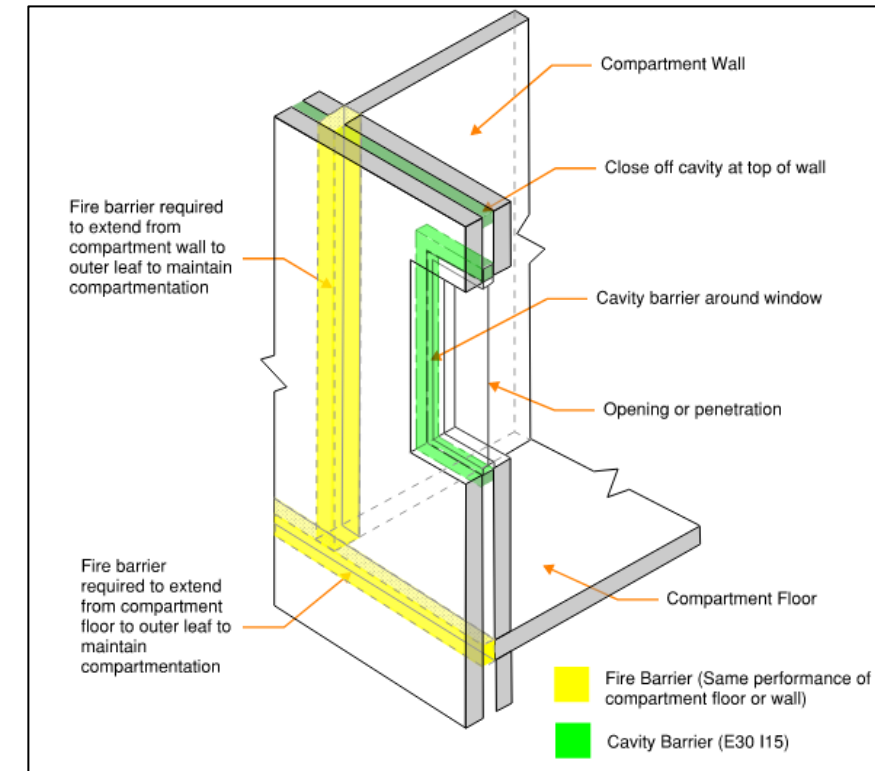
Provisions of Cavity Barriers and Fire Barriers
